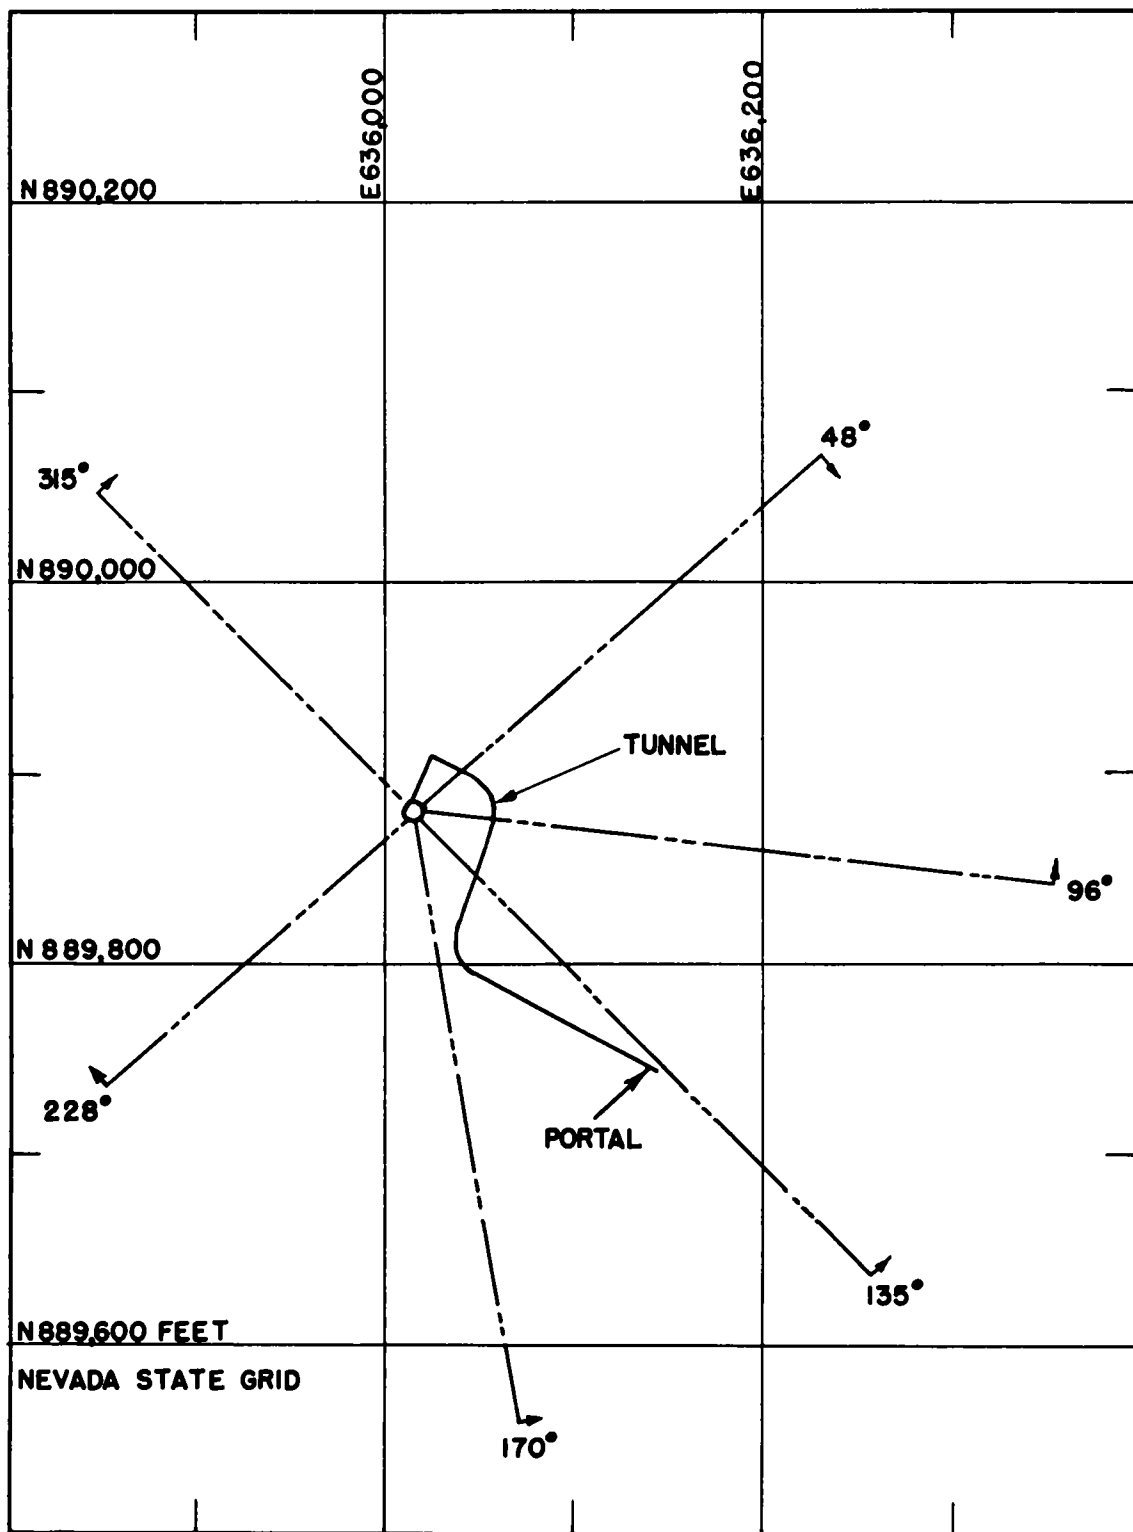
NEPTUNE CRATER SECTIONS PLOT PLAN
